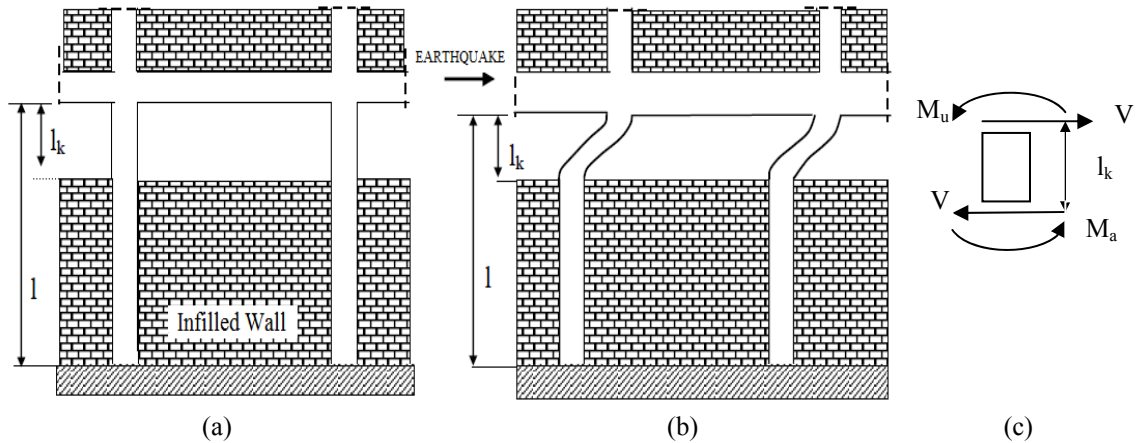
(a) Construction frame with infill wall; b). Behavior of short column when horizontal load (e.g., earthquake) acts on structures; c). Internal loads effecting short column
